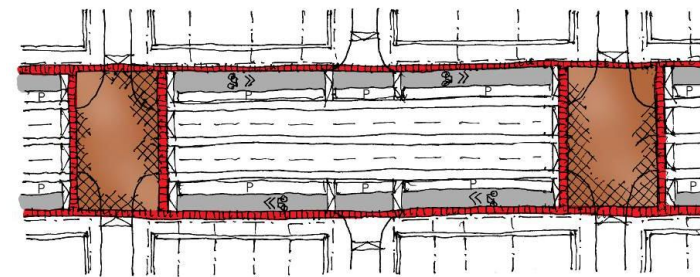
Example of road cross-section to provide business accessibility along major through route
